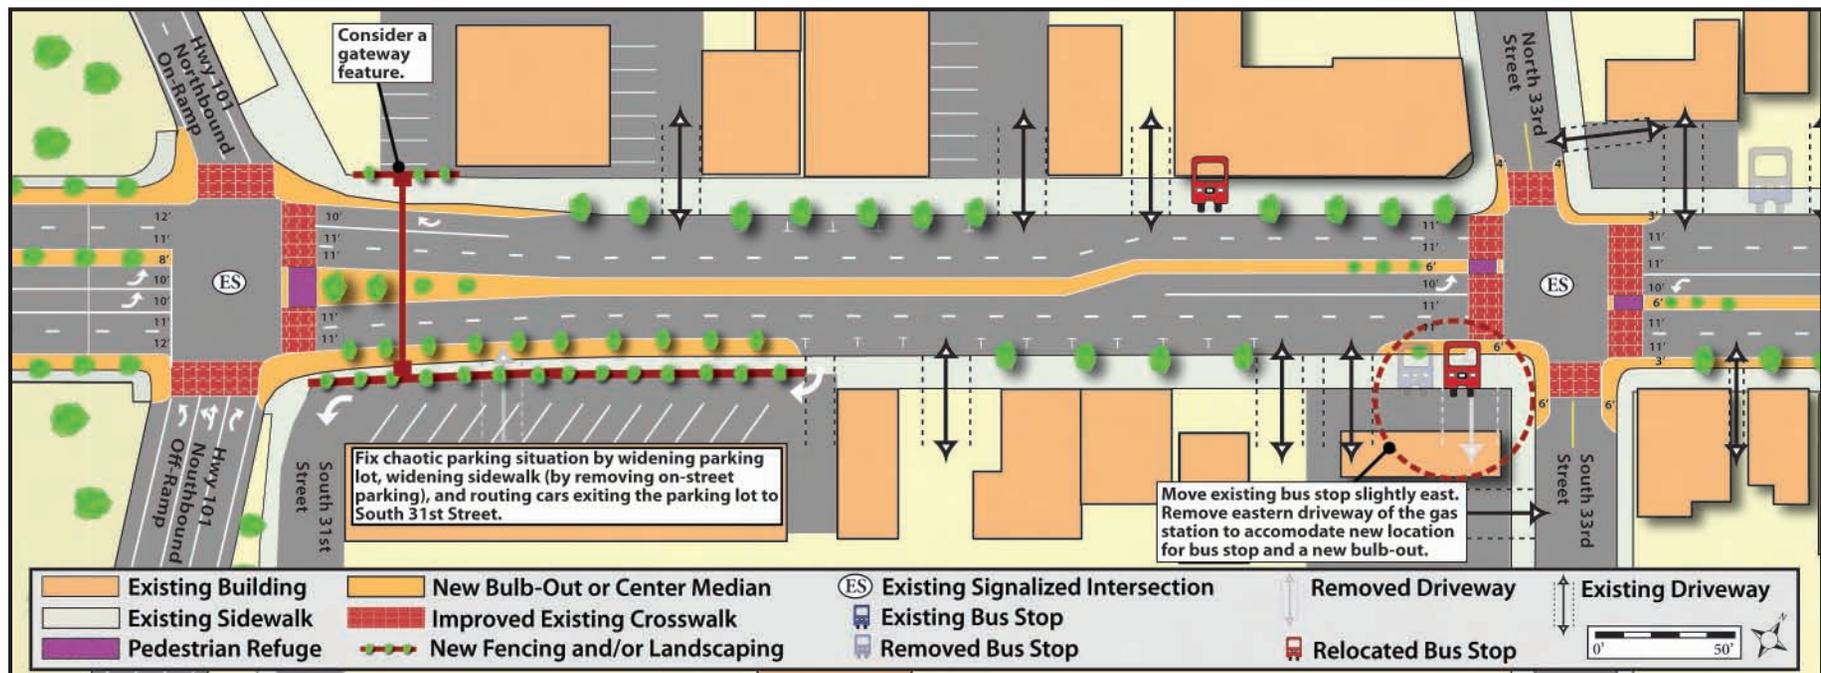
East Santa Clara Street/Alum Rock Avenue - Segment #7.
